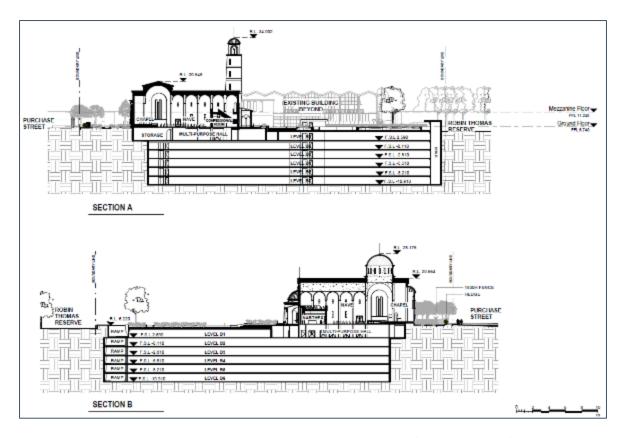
Extract of sectional drawing when viewed from the north and south elevations (longitudinal sections).
